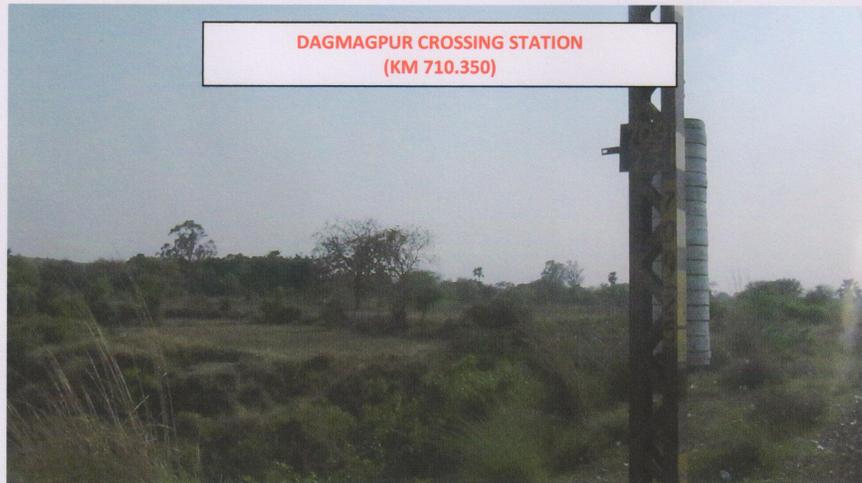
Site for Proposed Crossing Station at Mirzapur
